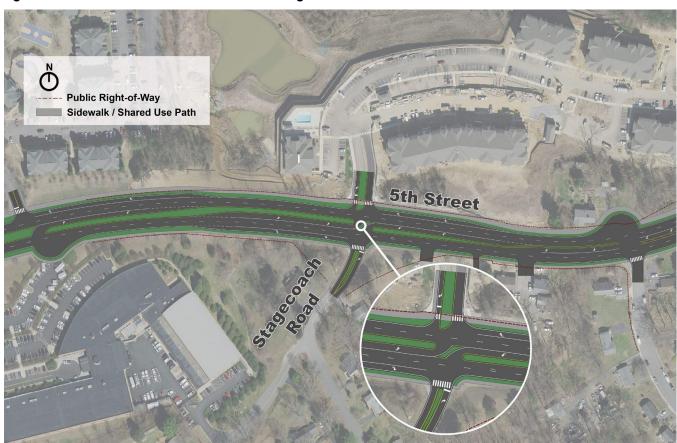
RCUT at intersection of 5th Street and Stagecoach Road
